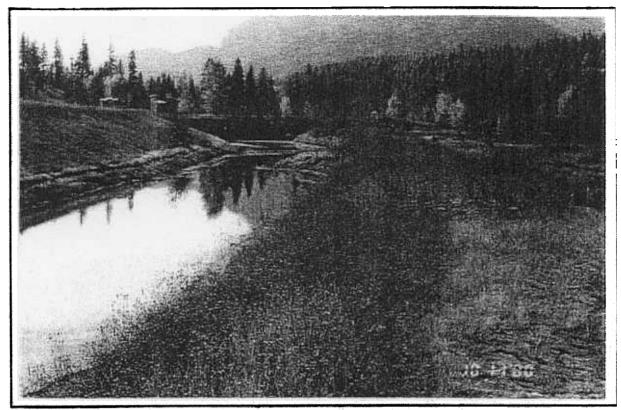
FROM WEST EMBANKMENT OF THE TOE POND DIKE LOOKING SOUTH. THE LOWER ACCESS ROAD, THE TOE OF THE ORIGINAL STARTER DAM, THE TOE POND, AND THE WEST EMBANKMENT OF THE TOE POND ARE SHOWN.
